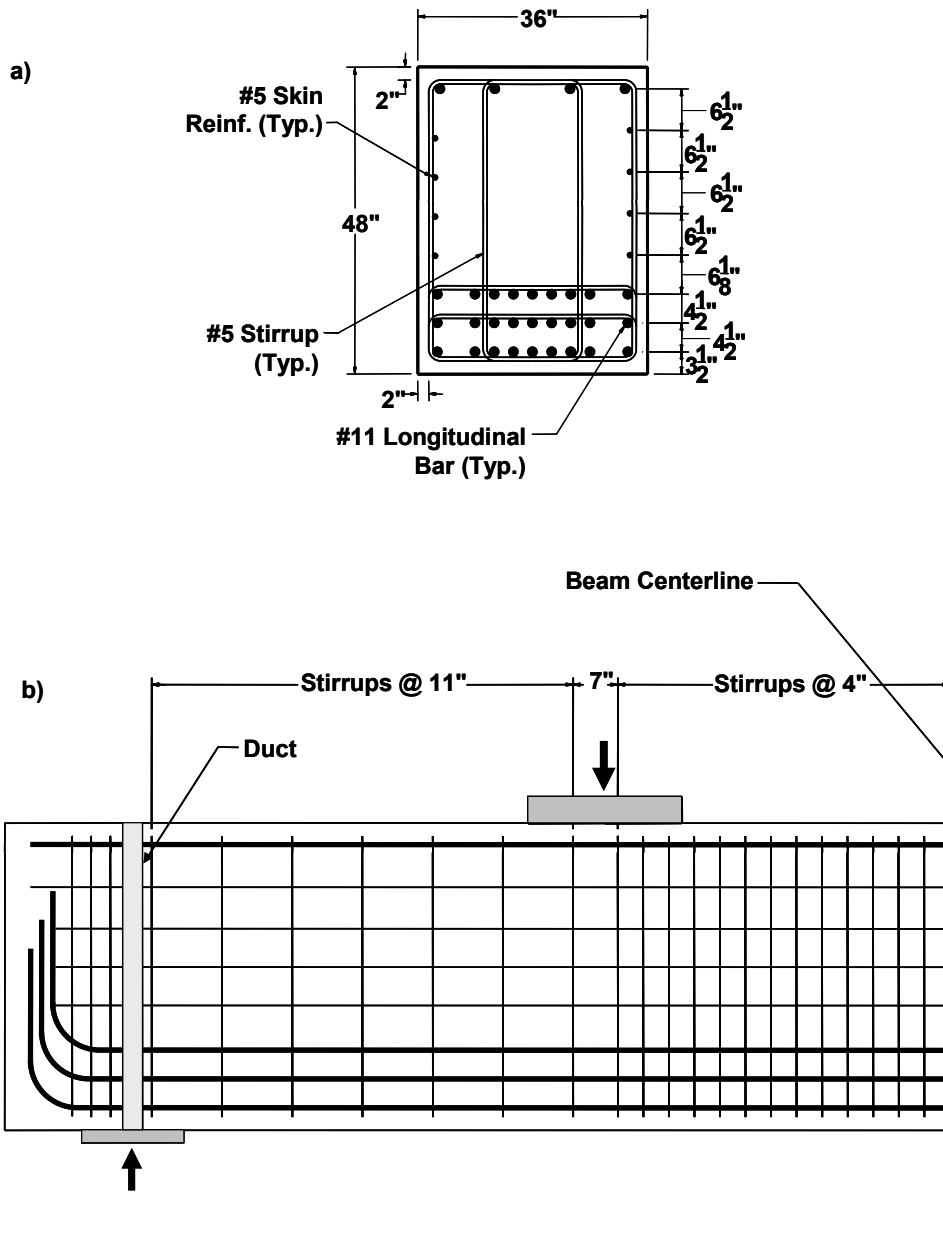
Shear span 1A a) Cross-section; b) Elevation
